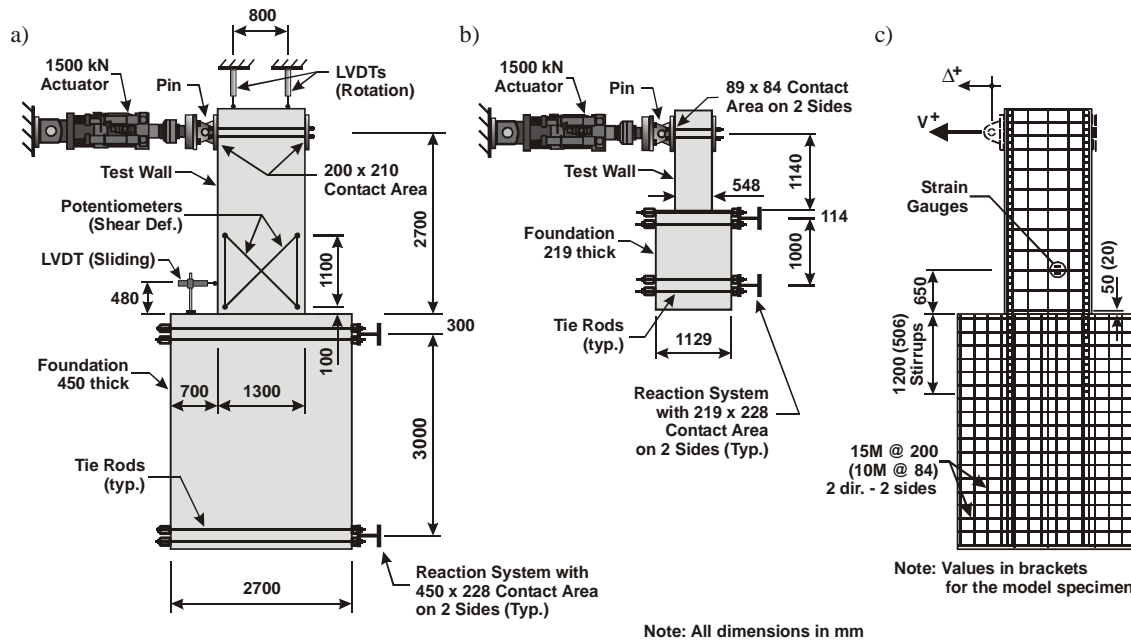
Test set-up: a) Prototype wall; b) Model wall; c) Reinforcement lay-out for both specimen sizes. (Note: All dimensions in mm; 25.4 mm = 1 in.).
